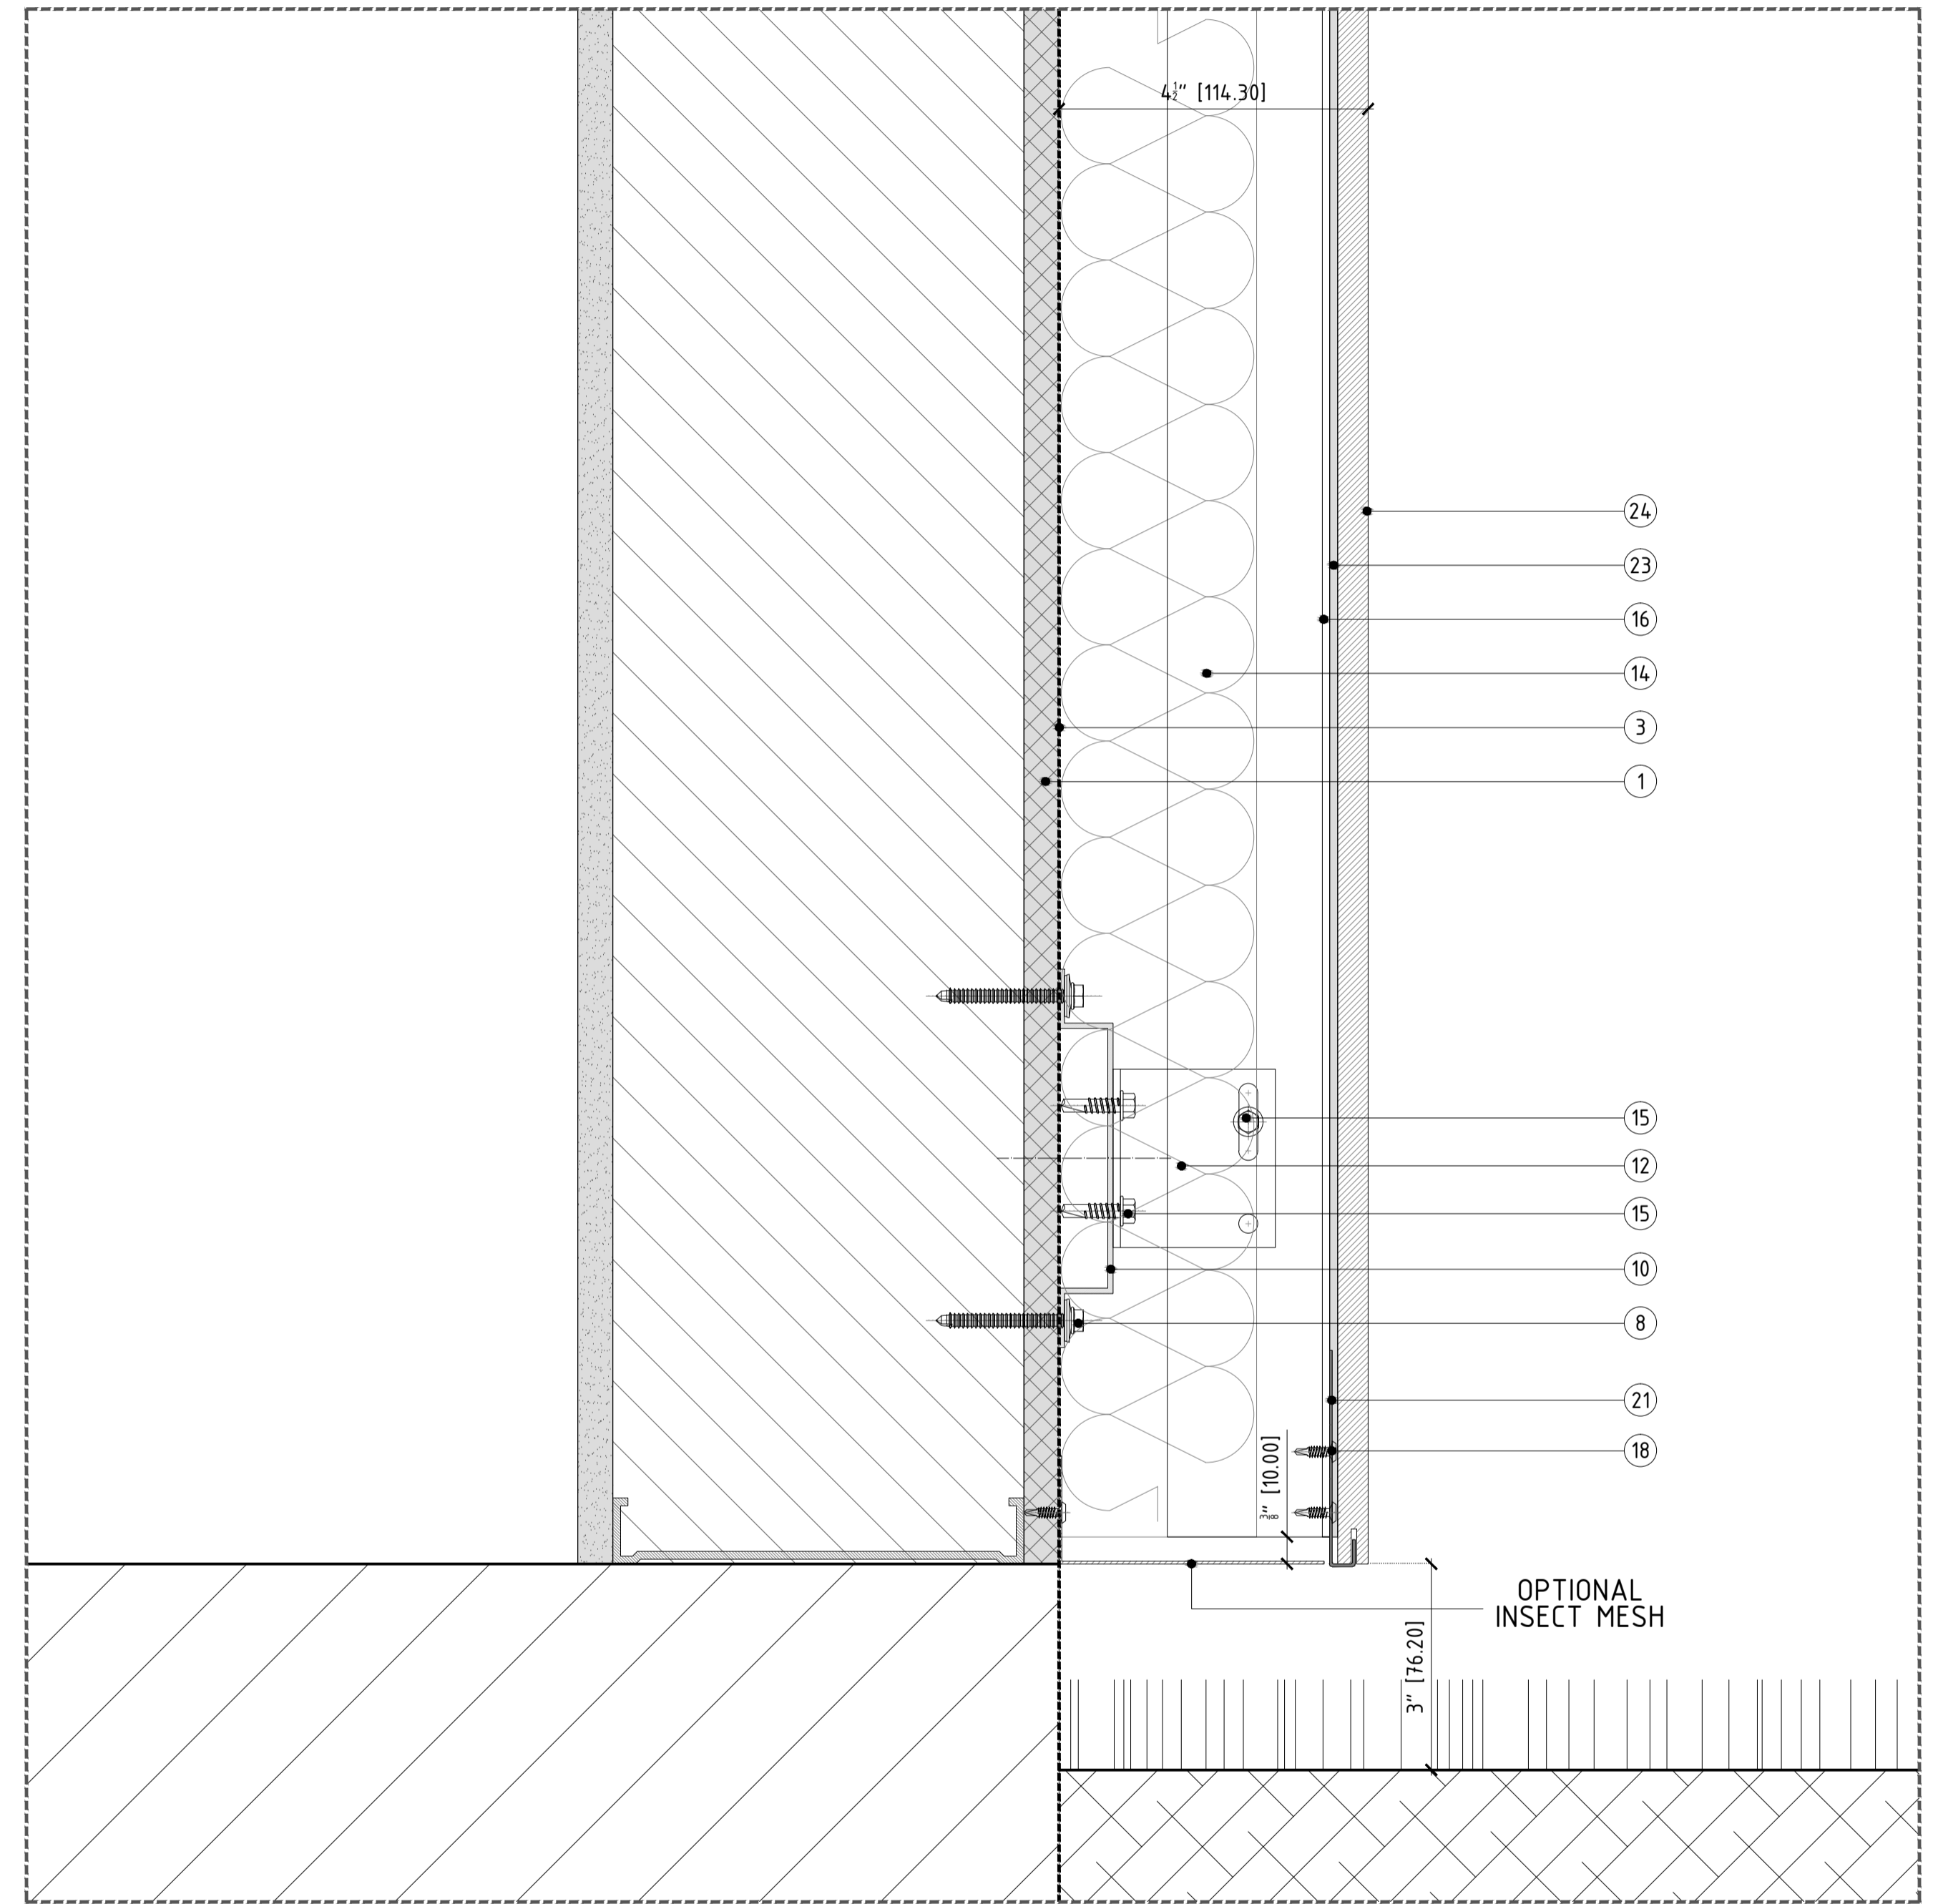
DETAIL A - TYPICAL DETAIL WITH HARD SURFACE
